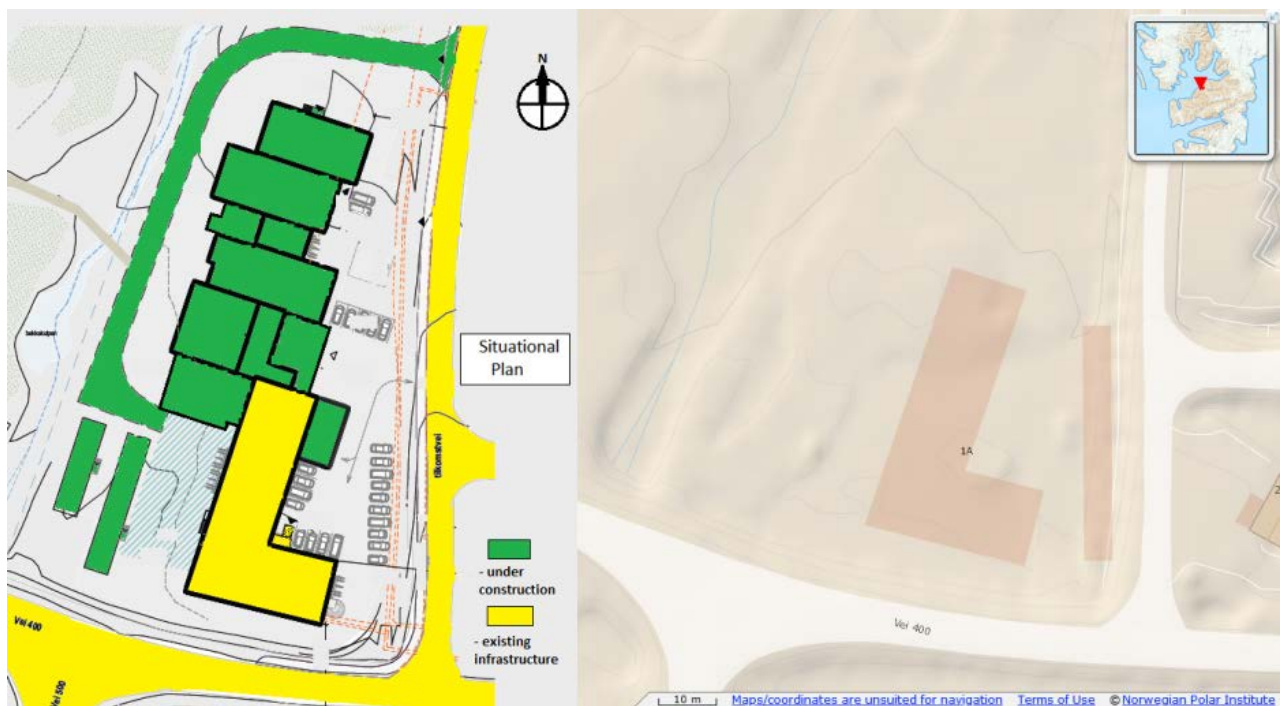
Site overview: left (a) – situational plan; right (b) – general location of the existing infrastructure (Norwegian Polar Insitute, n.d.)
